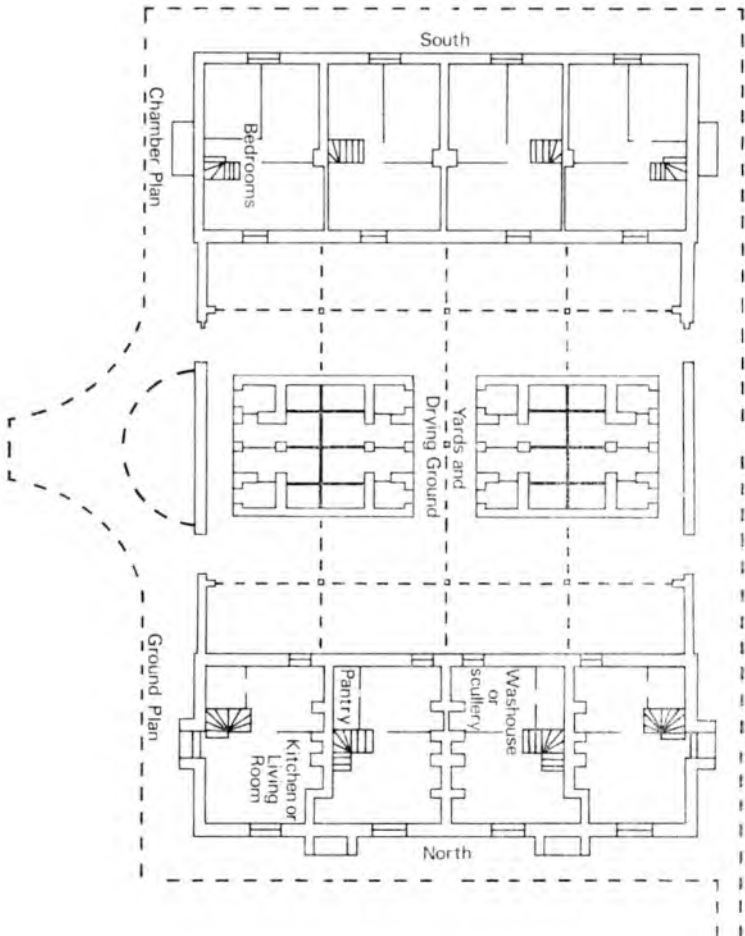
The Plans for Westbridge Cottages D.R.O. L/1258 ADD 80: 1849.
